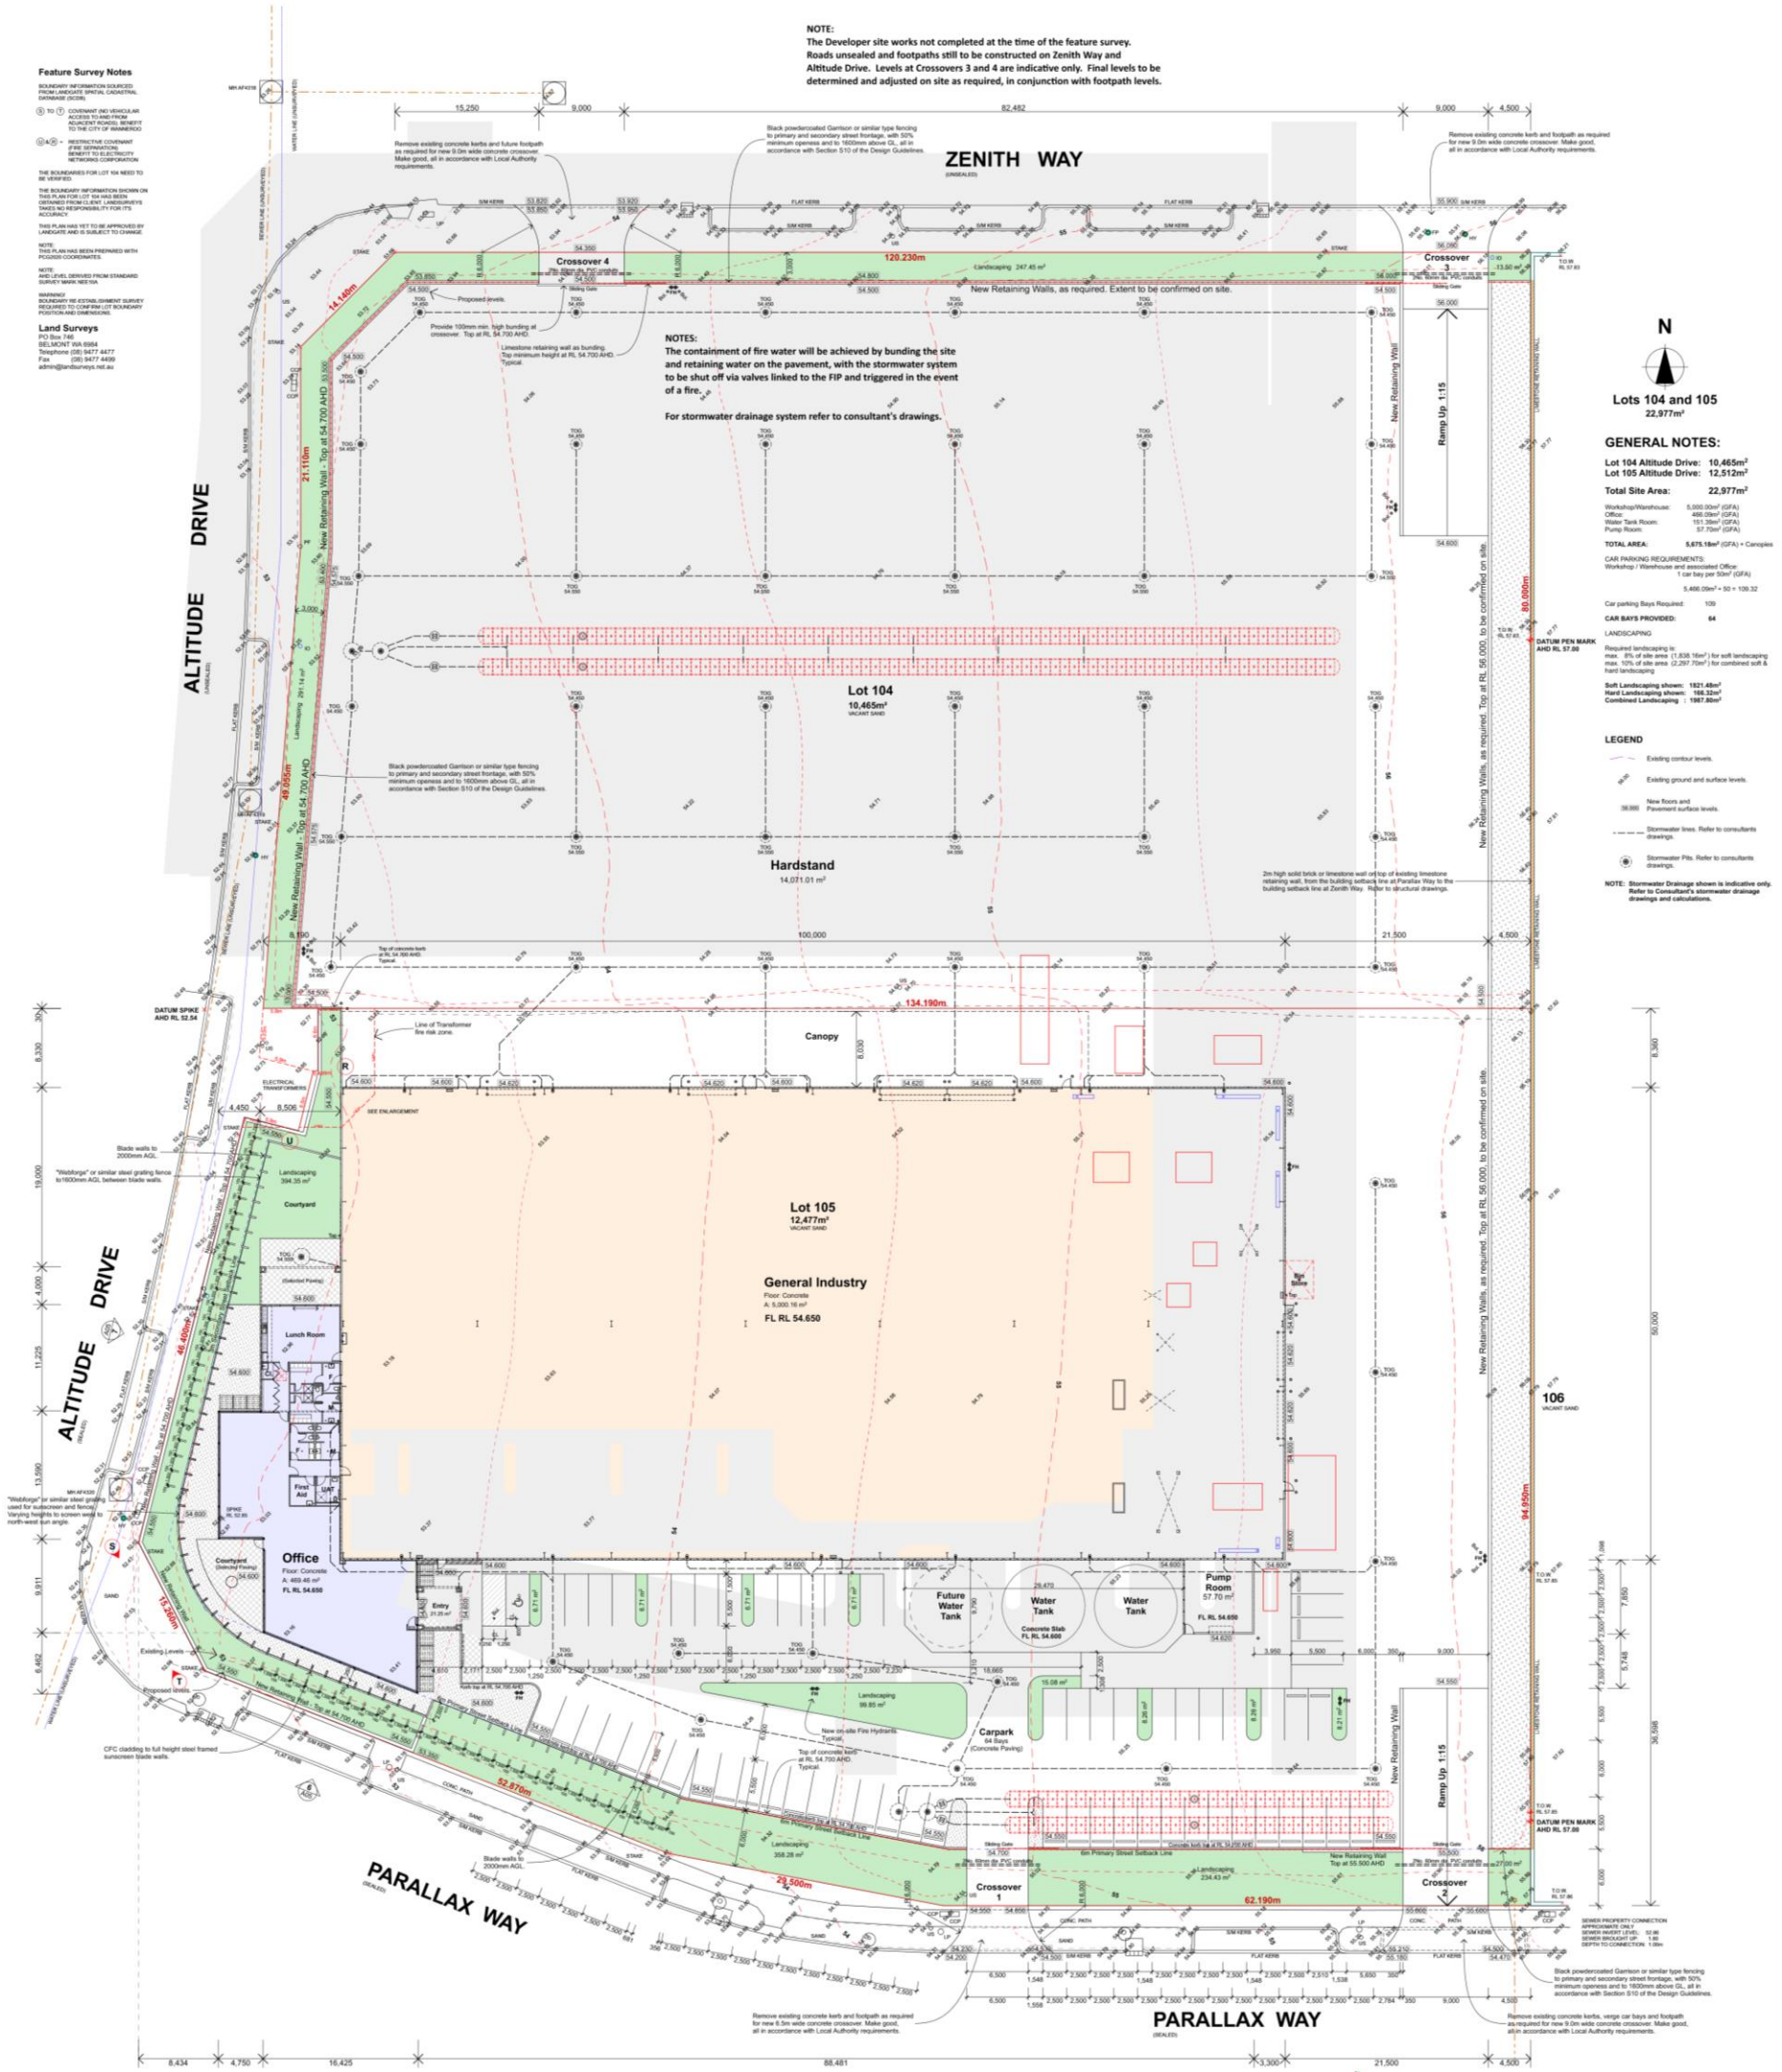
Site plan showing the premises stormwater drainage infrastructure
